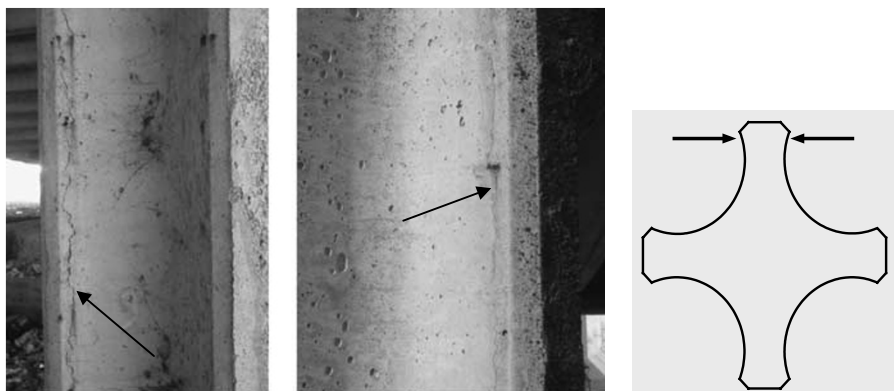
Longitudinal cracks due to corrosion of main reinforcement (registered always on the same corner of the columns due to the position of columns during concreting)
